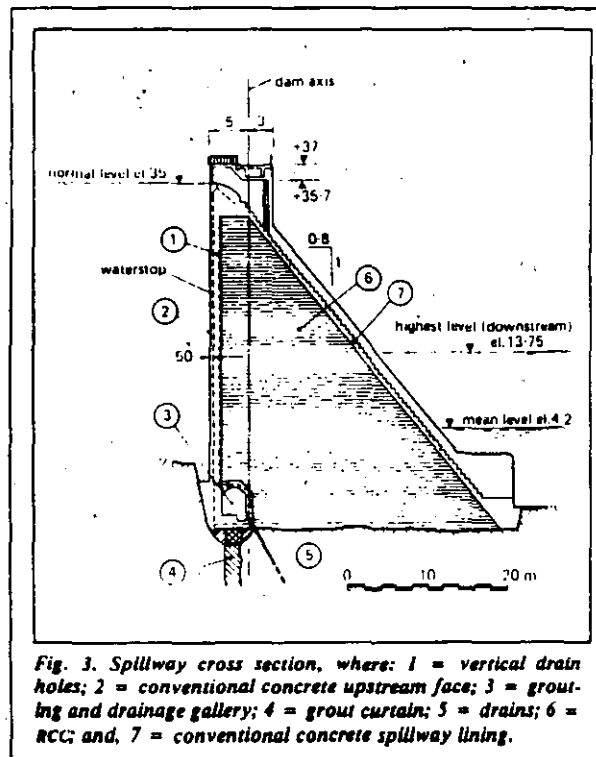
Spillway cross section, where: 1 = vertical drain holes; 2 = conventional concrete upstream face; 3 = grouting and drainage gallery; 4 = grout curtain; 5 = drains; 6 = RCC; and, 7 = conventional concrete spillway lining.
